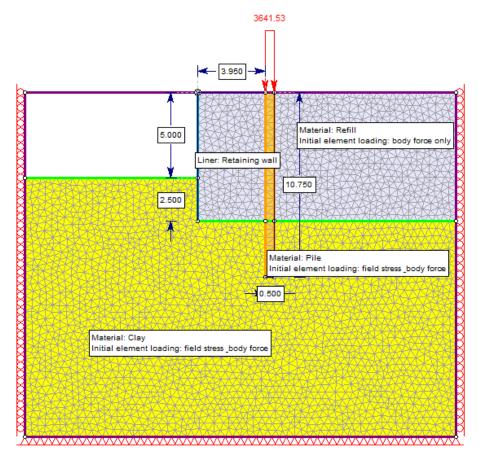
Stage 3: Pile installed on the right side of retaining wall and factored loading applied on the top of pile
